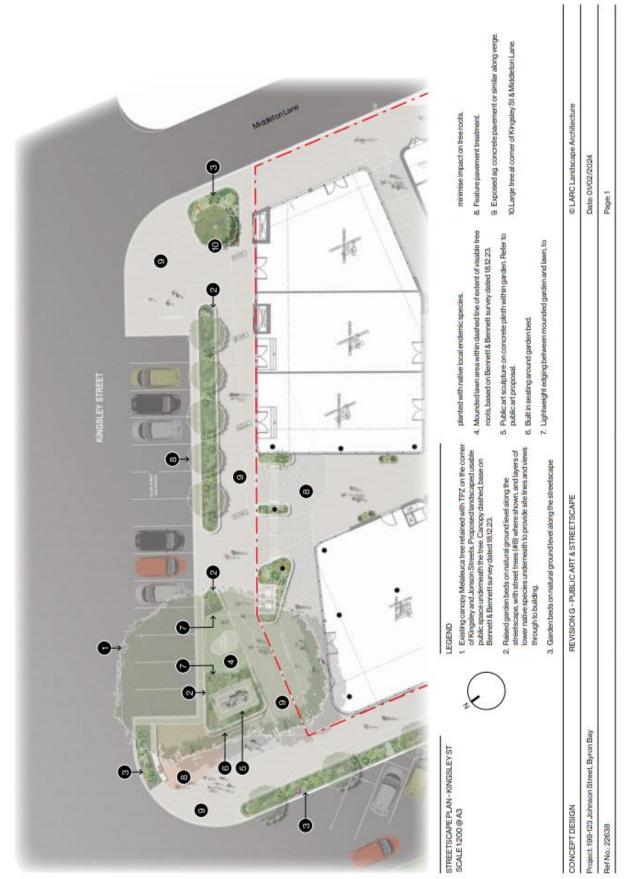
Landscape plan with assumed positioning of artwork overlaid on (2)
